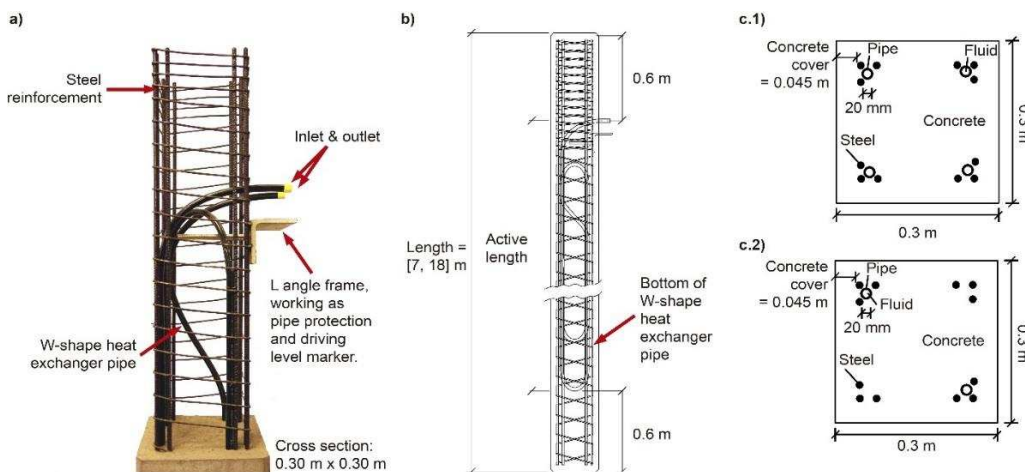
a) Demonstration model of the precast energy pile with W-shaped heat exchanger pipes fitted to the reinforcement bars; b) vertical profile; c.1) horizontal cross section of the W-shape energy pile and; c.2) horizontal cross section of the single-U energy pile.
